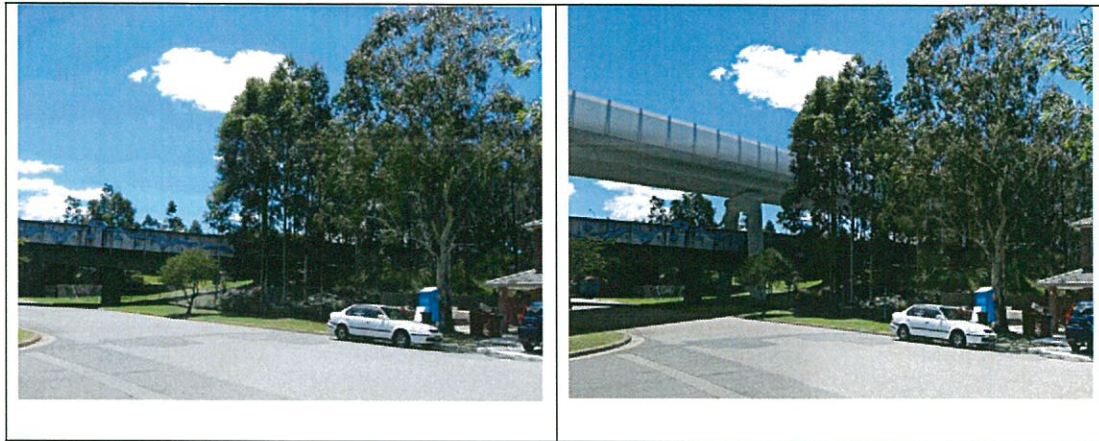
Existing view and indicative montage looking north east along Arthur Street
